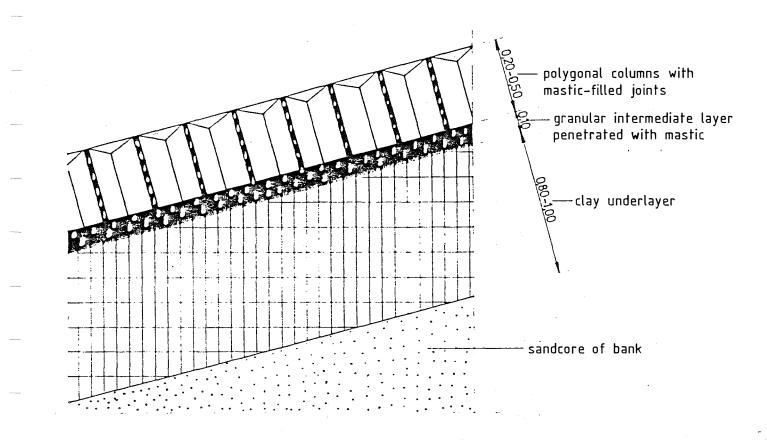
Closed revetment on impermeable intermediate layer with impermeable under-layer.
